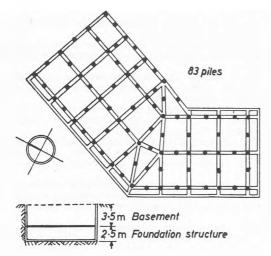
Foundation plan and pile layout Plan de fondation et localisation des pieux
